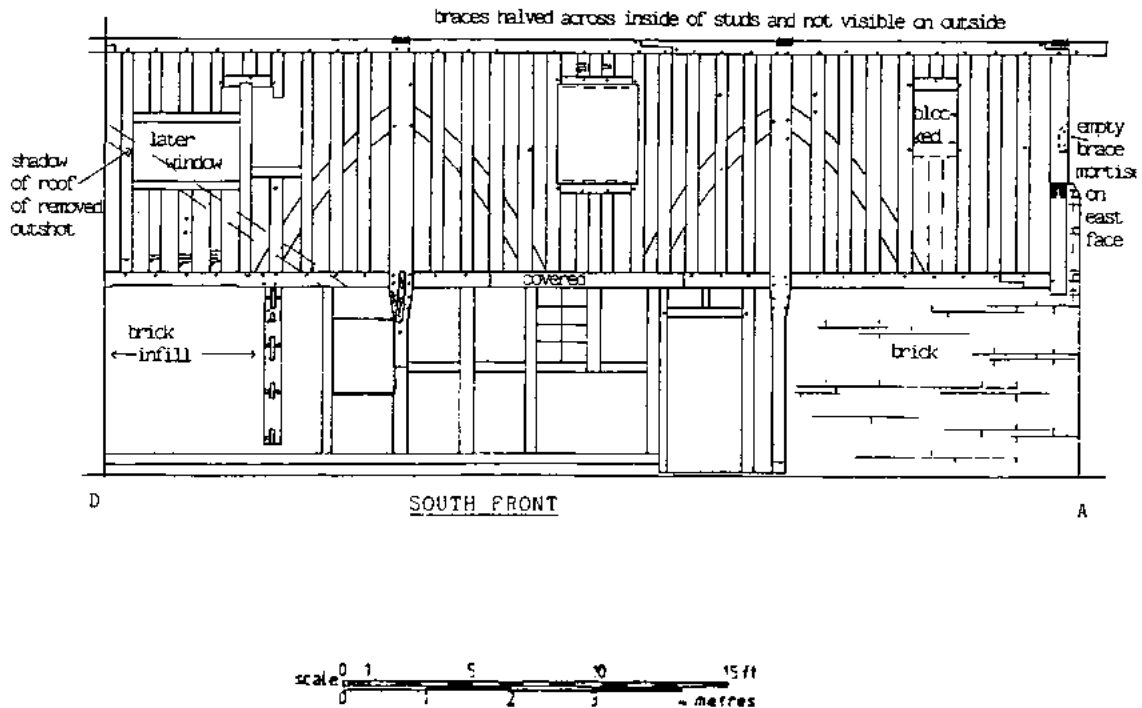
South wall of the Lodging Range of Newland Hall, Roxwell.
